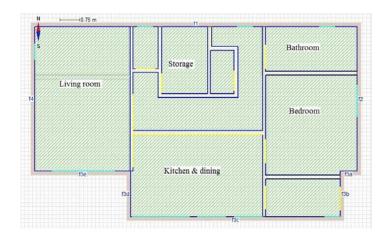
Floorplan, of baseline building, ground floor, zoning in IDA ICE
